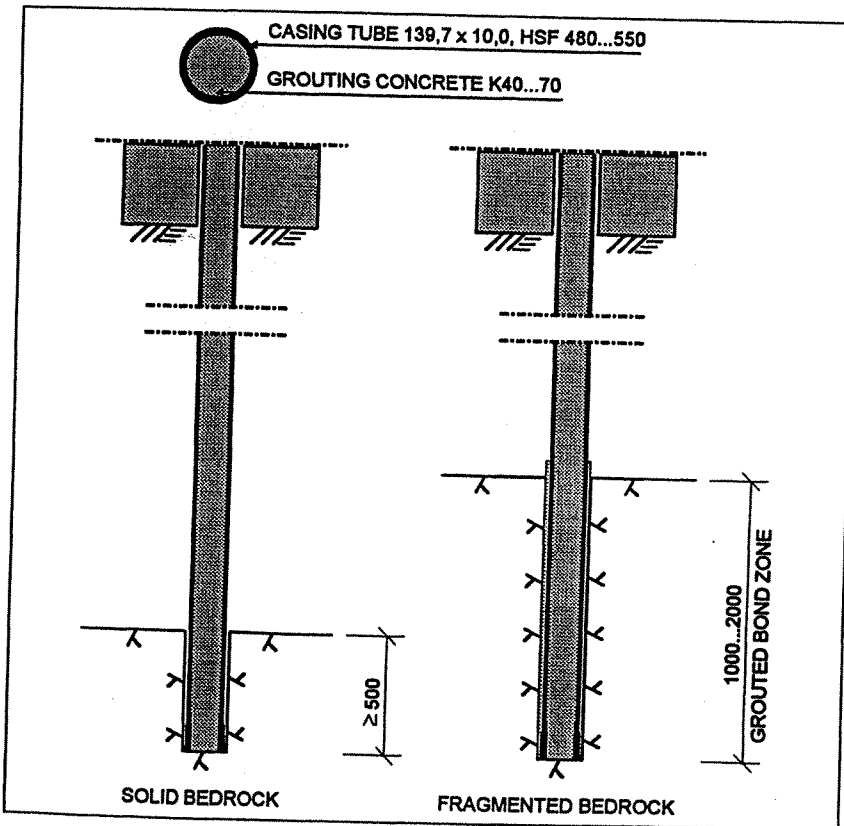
Pile type for underpinning of existing foundations in restricted headroom.
